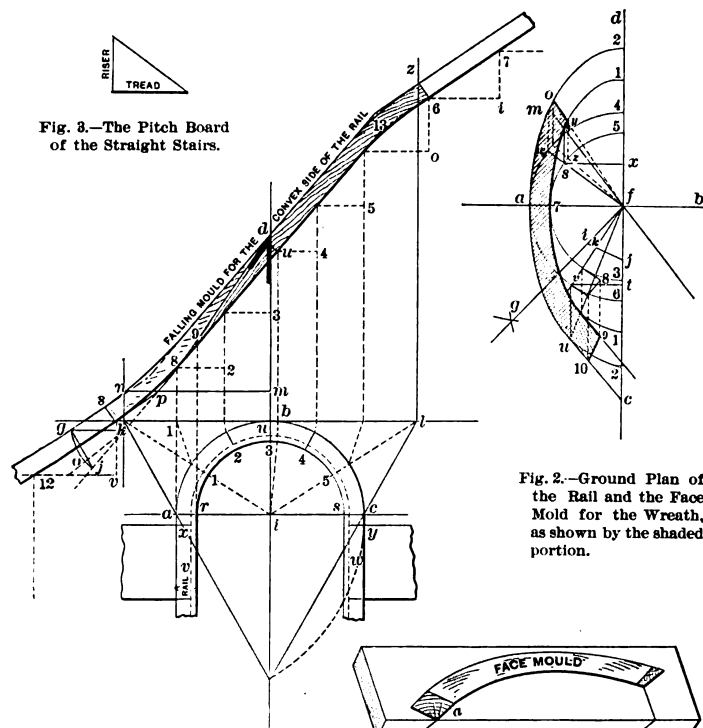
Plan of Semicircular Stairs, with Elevation of the Risers and the Falling Mold.
